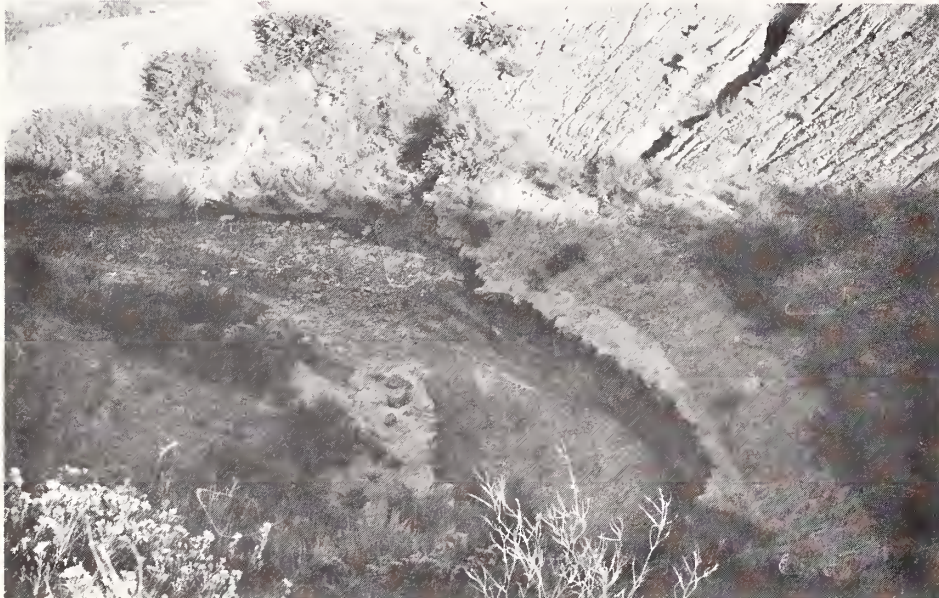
DEGRADED OUTLET CHANNEL OF CULVERT NO. 40
